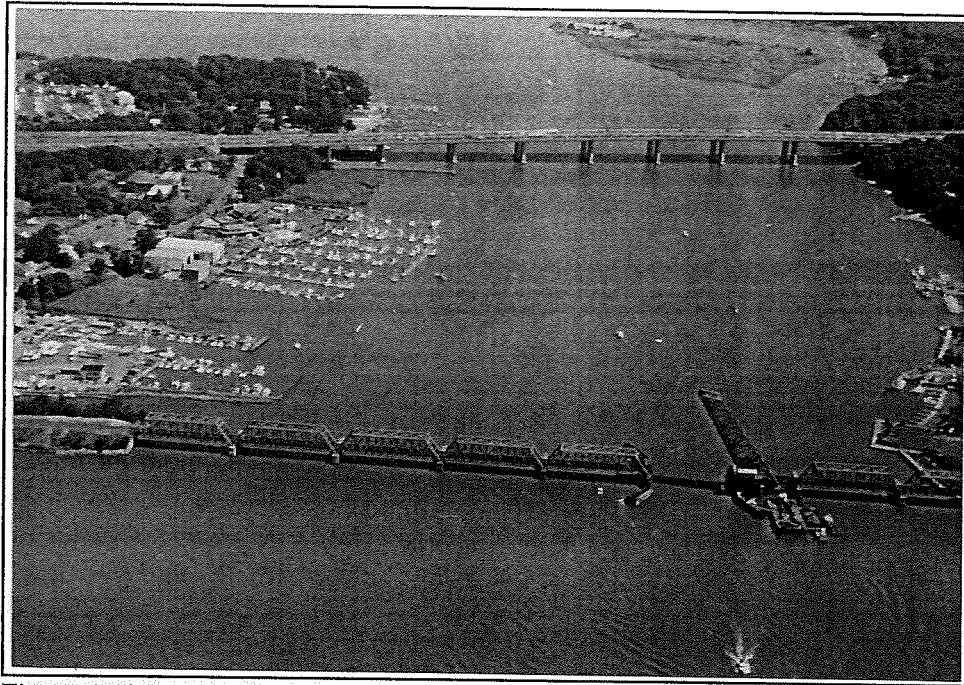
Baldwin Bridge (I-95) and railroad bridge (with open span) across the Connecticut River; “between the bridges” marine facilities to left.
